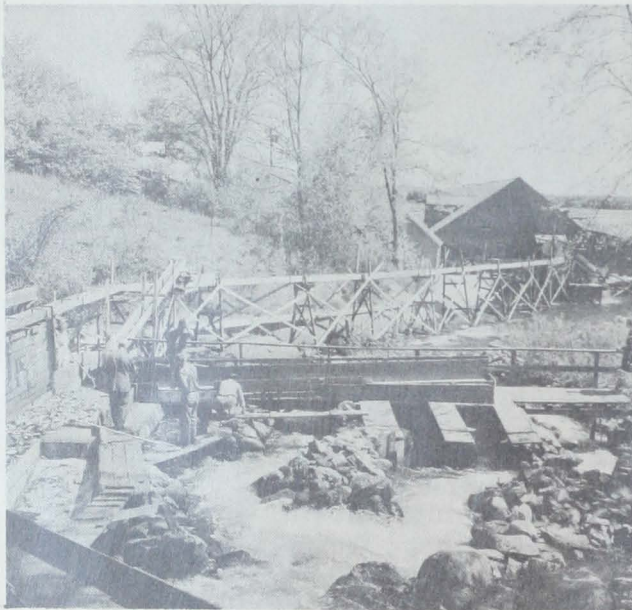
TRAP, SLUICeway, AND PLANT.
